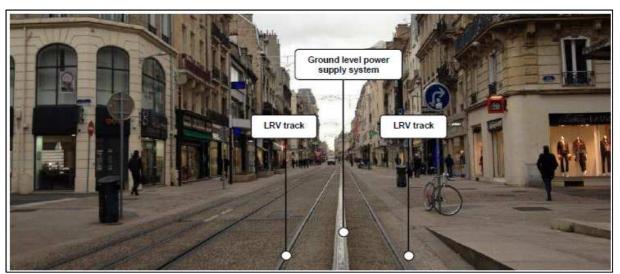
The 'third' track power arrangement as seen in Bordeaux
